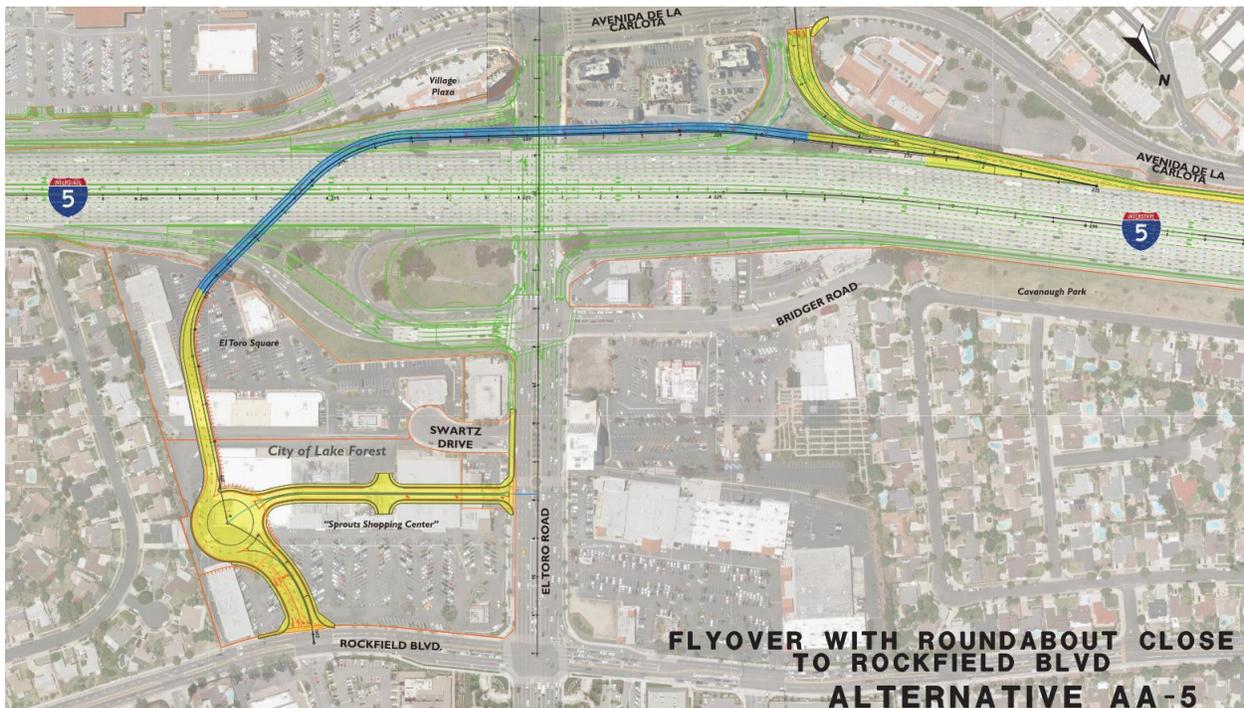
Alternative AA-5 Flyover with Roundabout (Close to Rockfield Boulevard)
